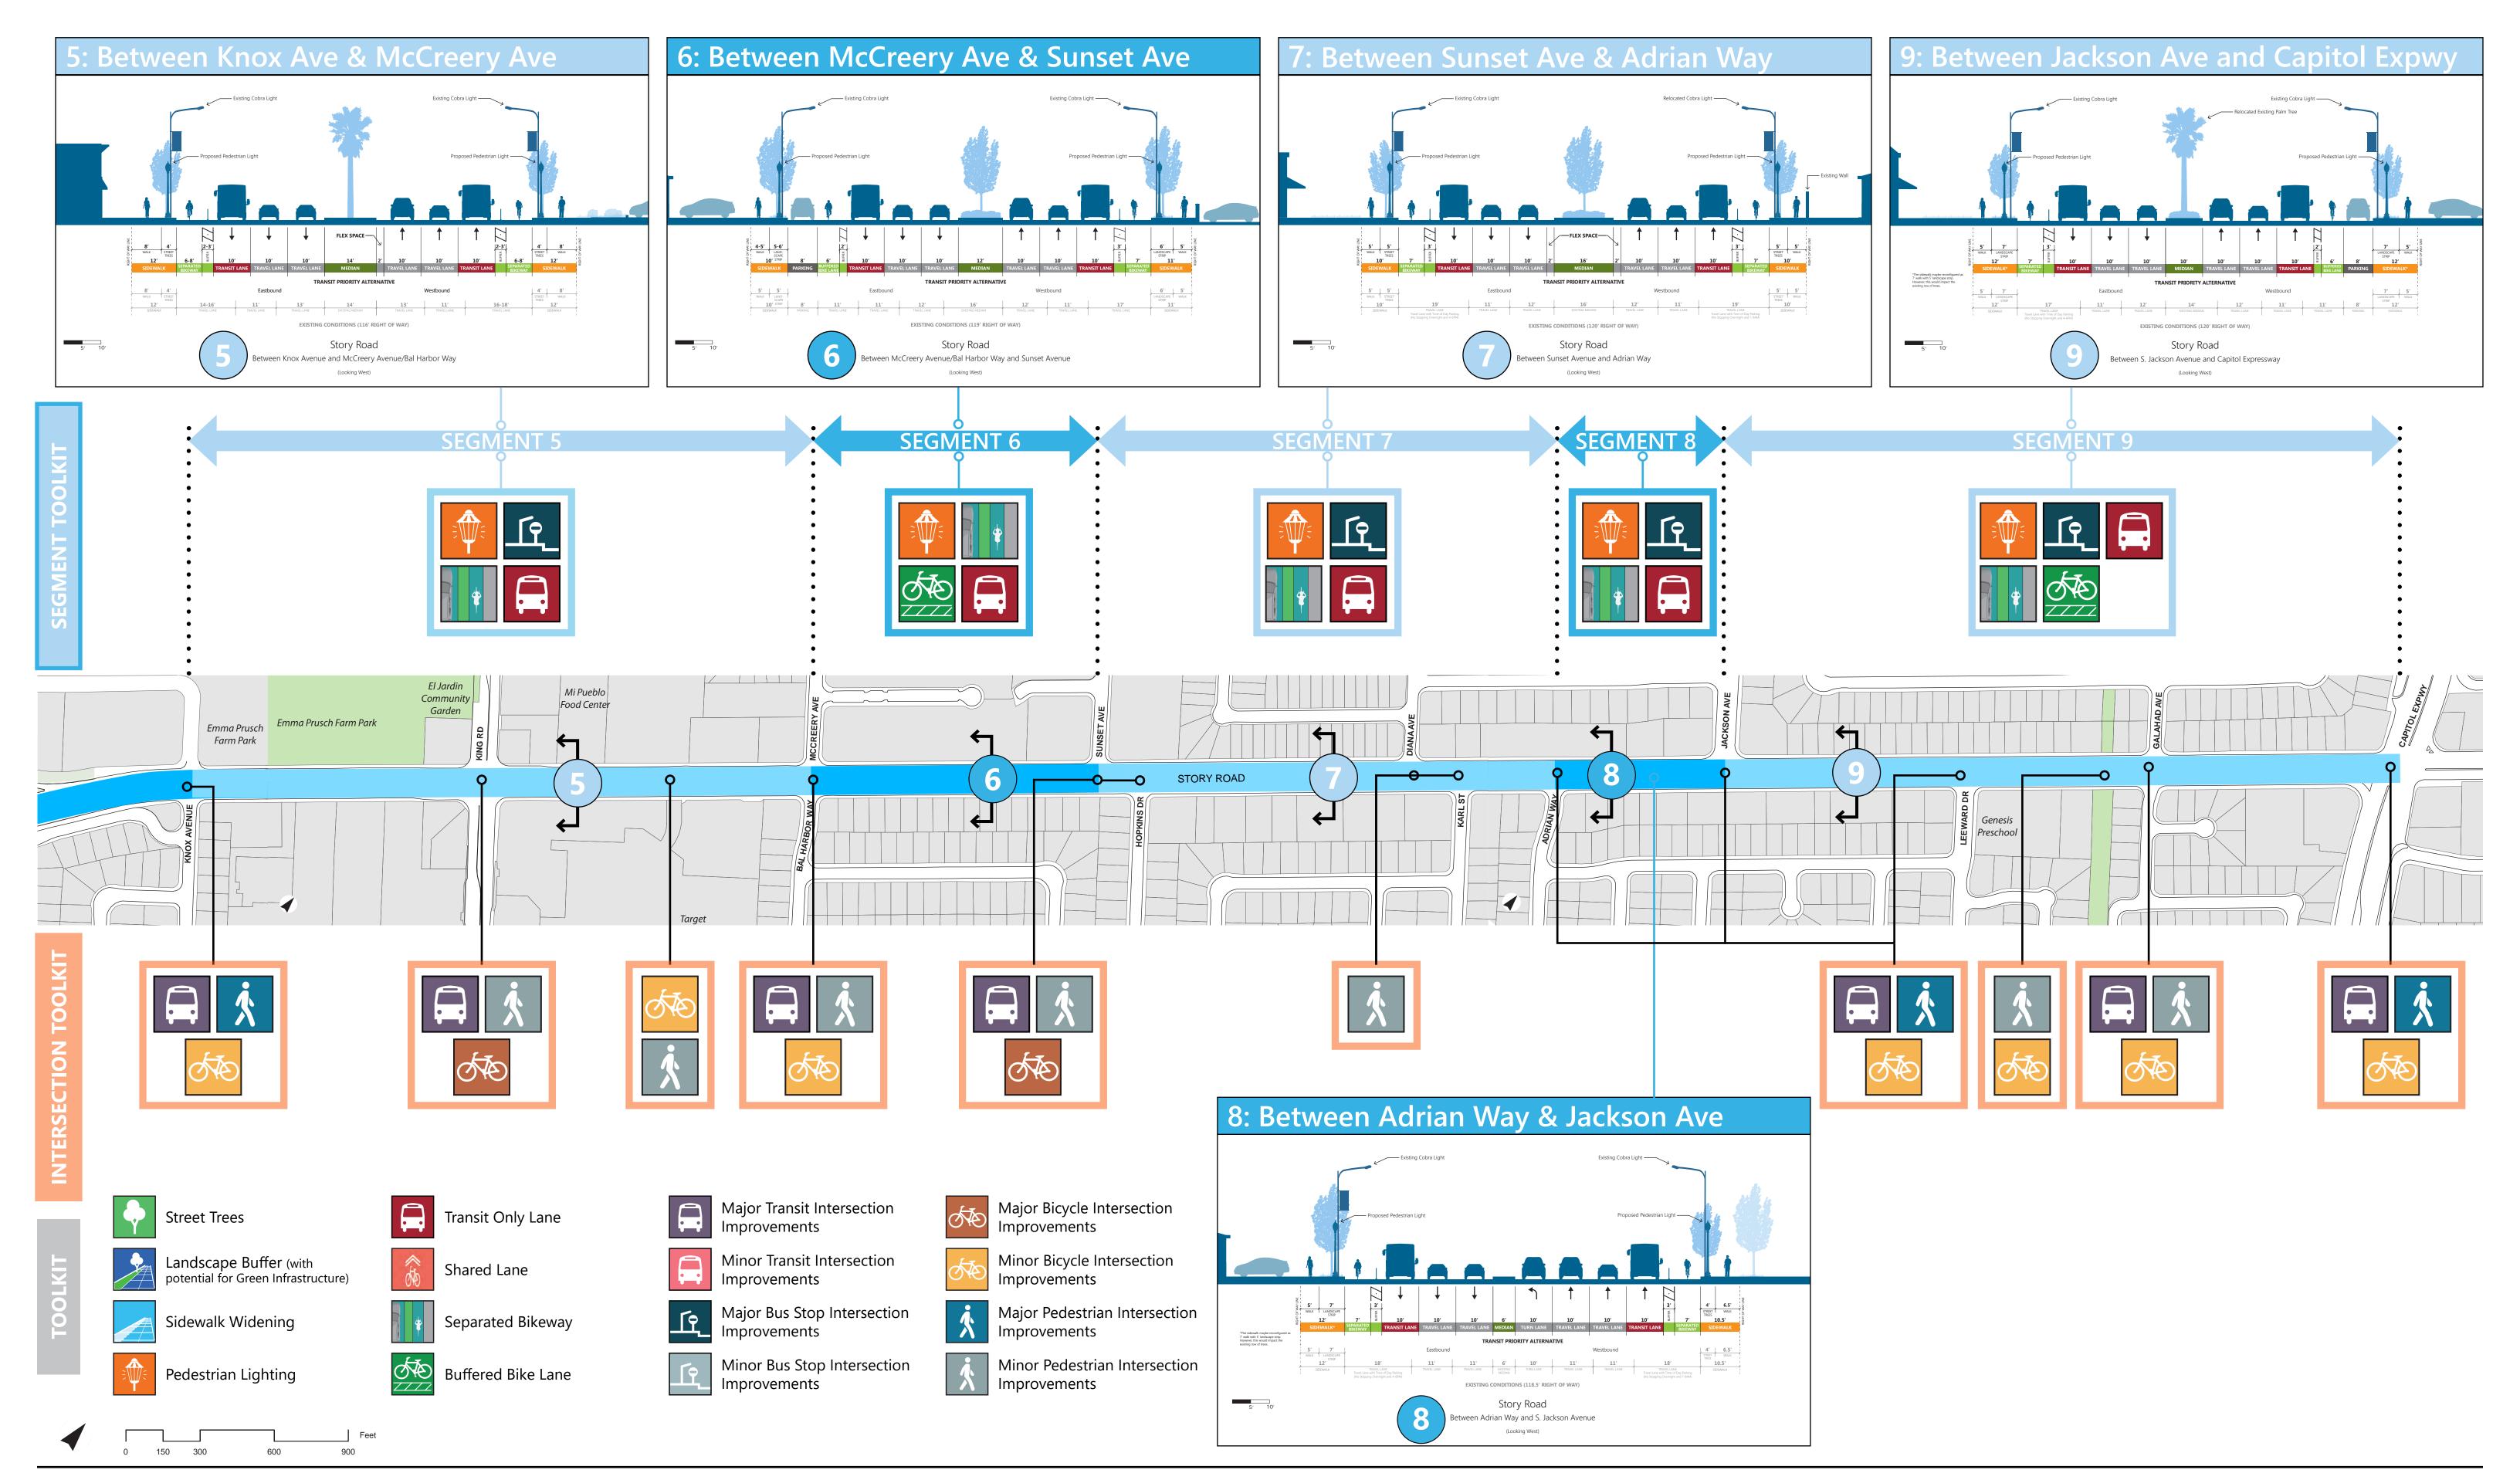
B: Story Road at Knox Avenue to Story Road at Capitol Expressway TRANSIT PRIORITY ALTERNATIVE
